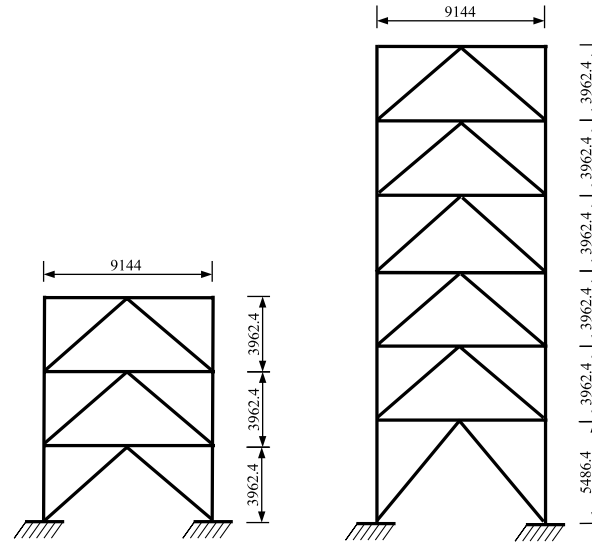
Elevation view of the 3- and 6-storey frame. Dimensions are expressed in mm.
